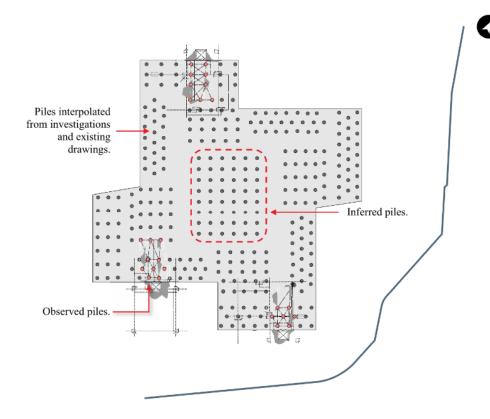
Plan showing anticipated existing foundations of Euston Tower
